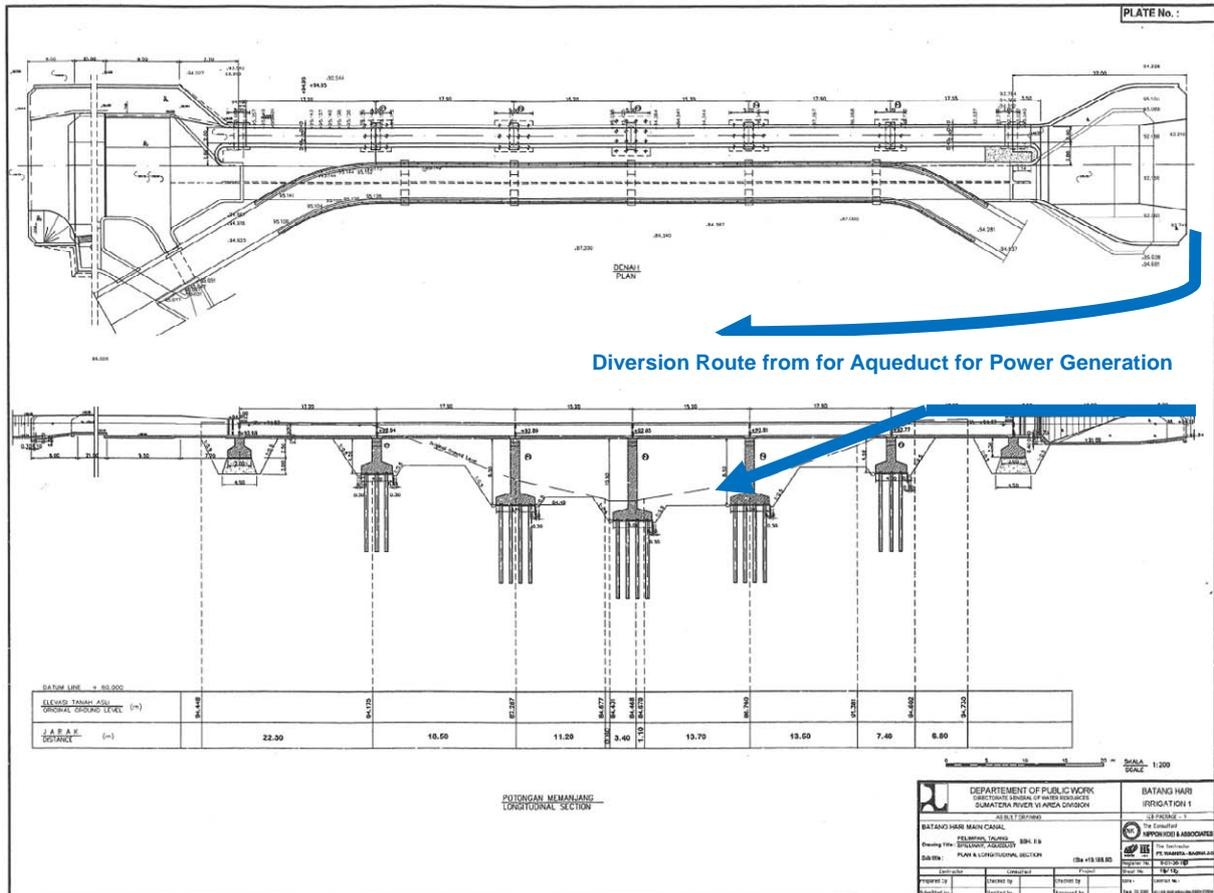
Plan and Profile of Existing Aqueduct
